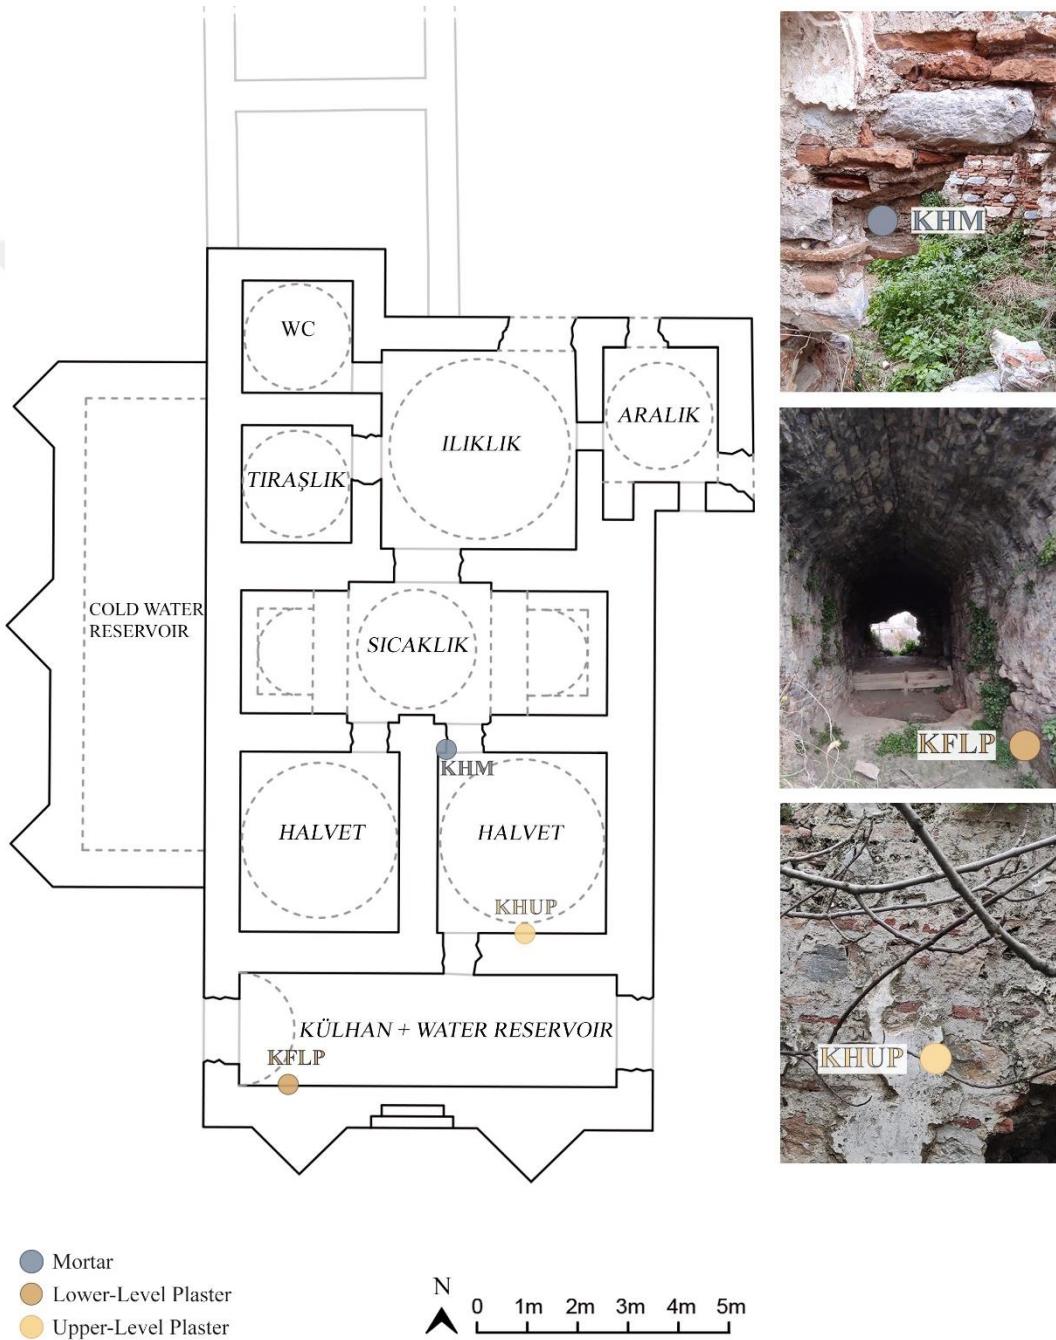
Kale Altı Bath Plan and collected sample photos
